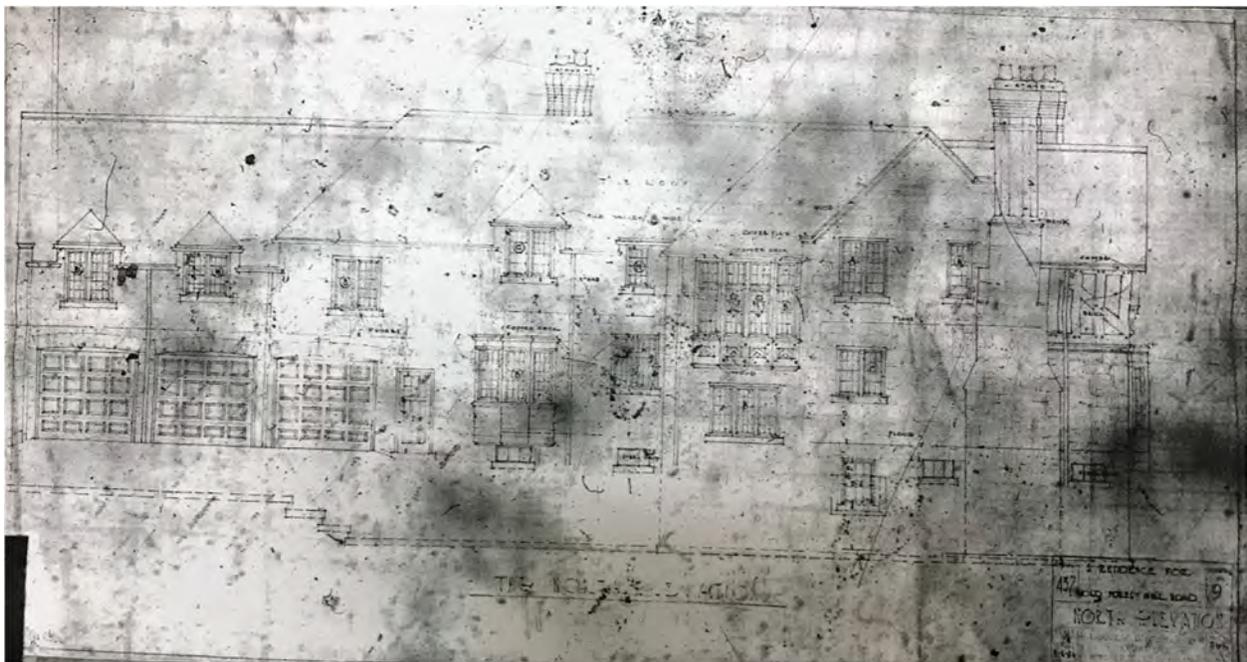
1934 architectural drawing by Douglas Kertland, showing the north elevation. (Building Records)
